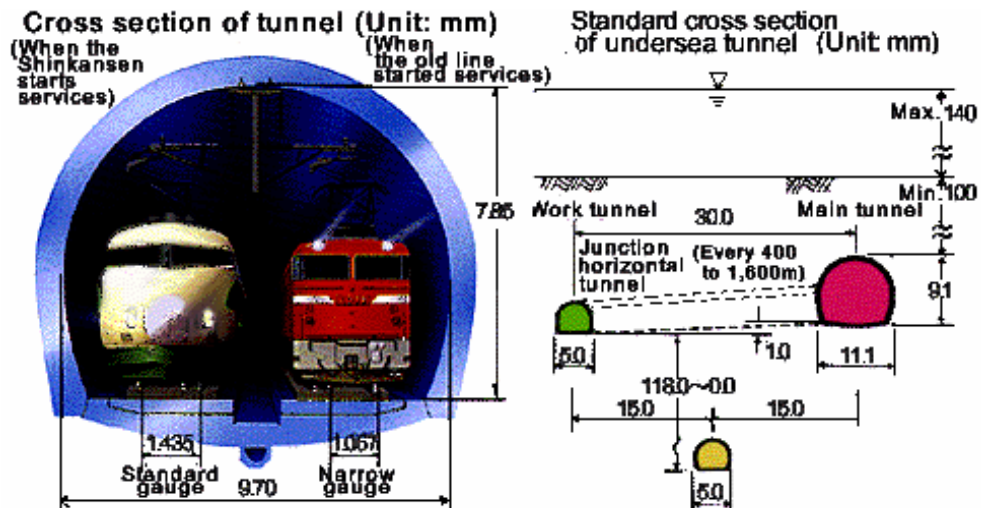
Seikan Tunnel, Japan, under the sea: Honshu-Hokkaido
